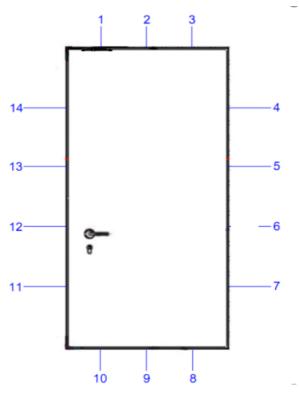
Initial Clearance Measurement Positions (View from unexposed side)
